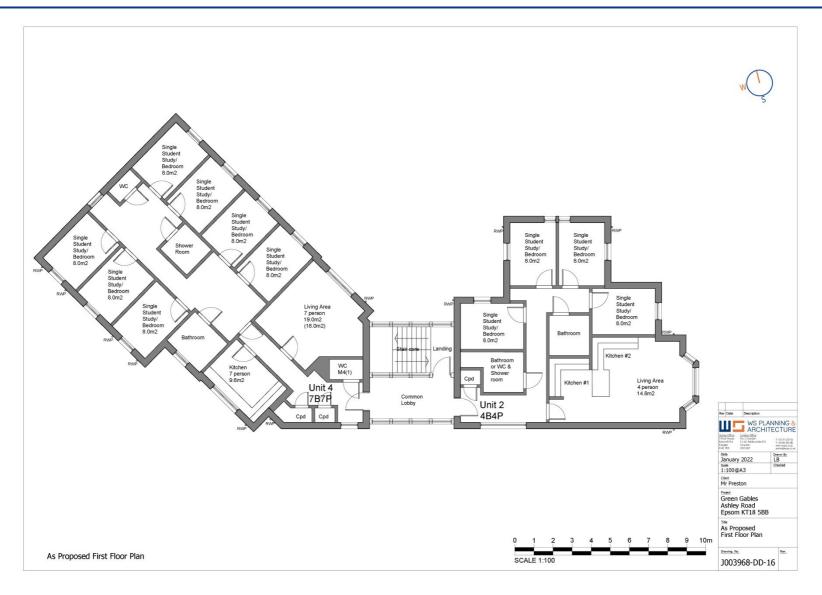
First Floor Plans (Drawing Number J003968-DD-16)
